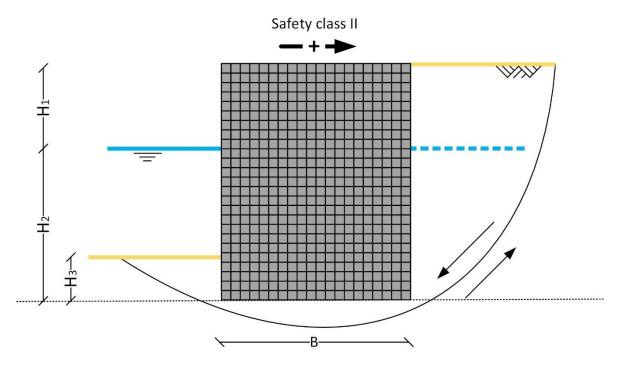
A possible circular failure plane, showing the driving and resisting forces along the plane
